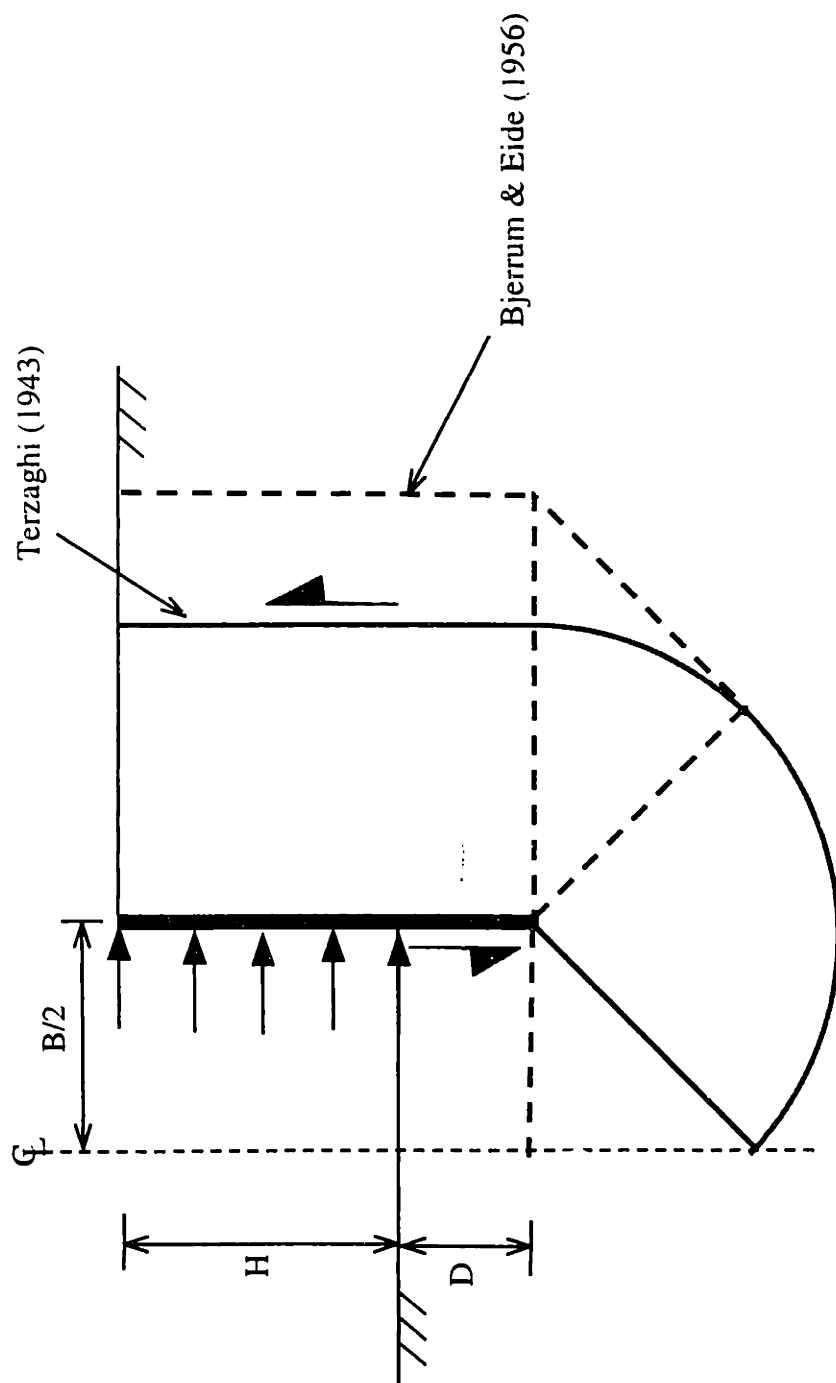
Conventional modifications of basal heave calculations for braced excavations with wall embedment
